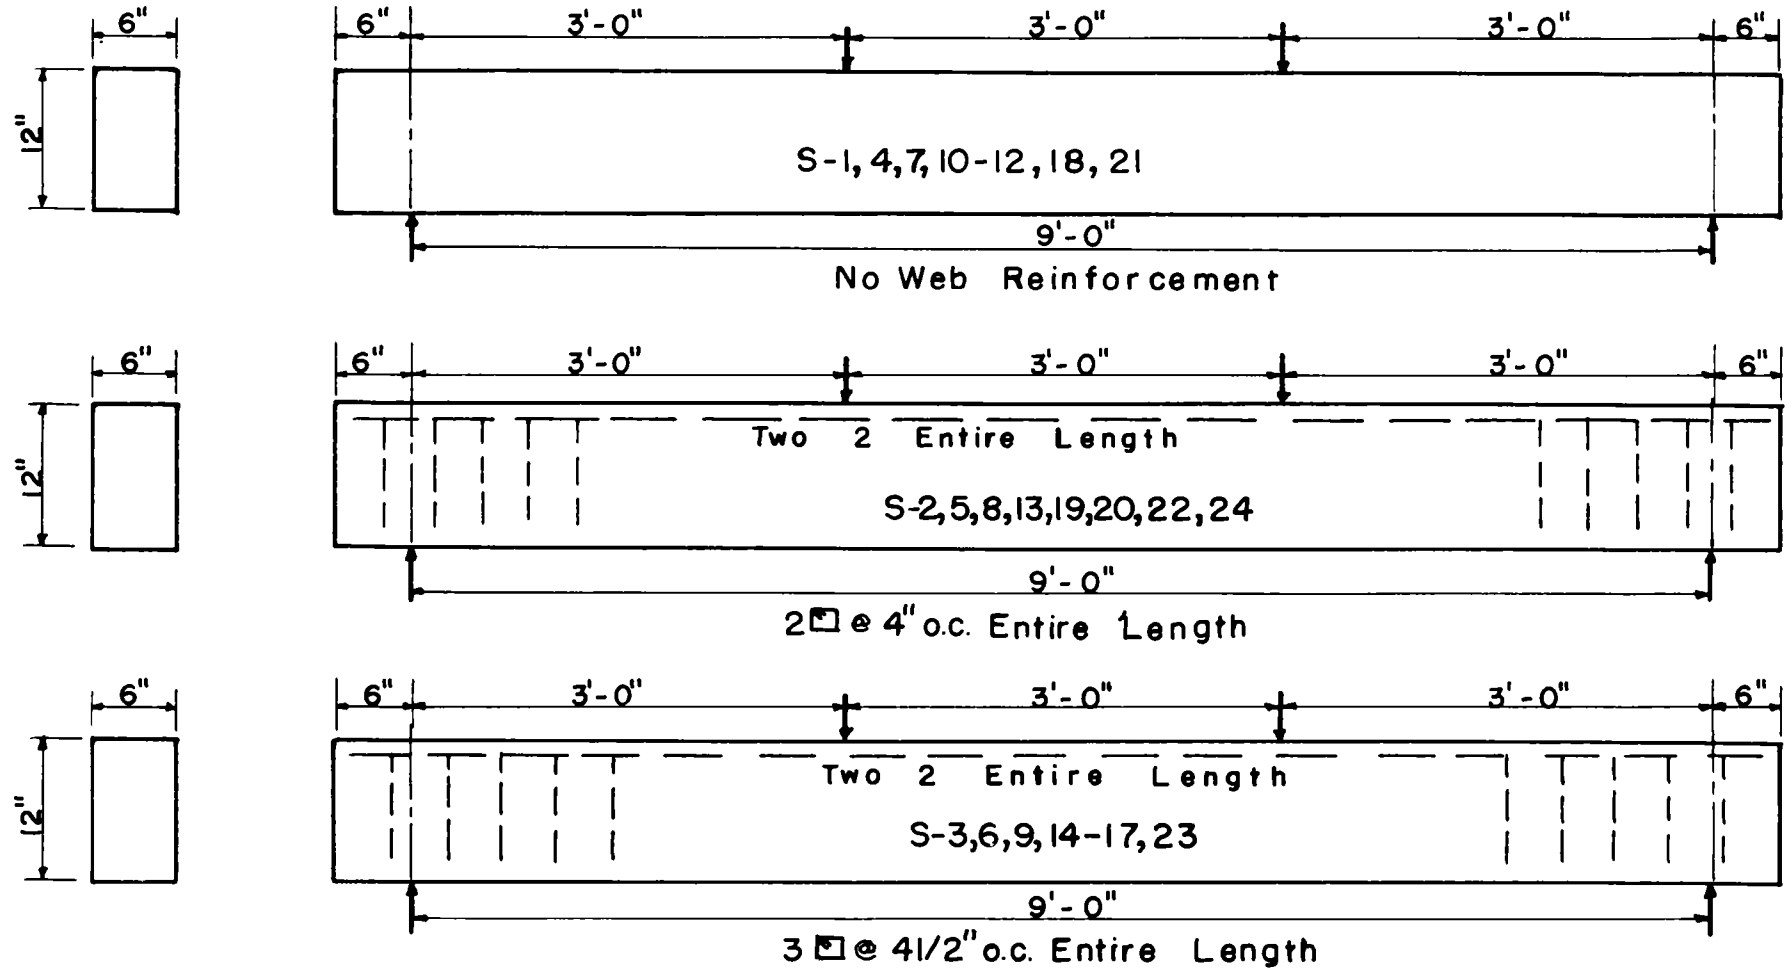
DIMENSIONS, WEB REINFORCEMENT AND LOADING ARRANGEMENT FOR BEAMS
